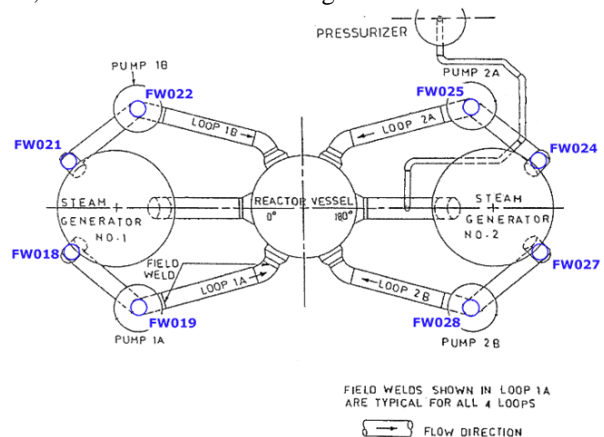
RCS arrangement and cross-over leg welding points
